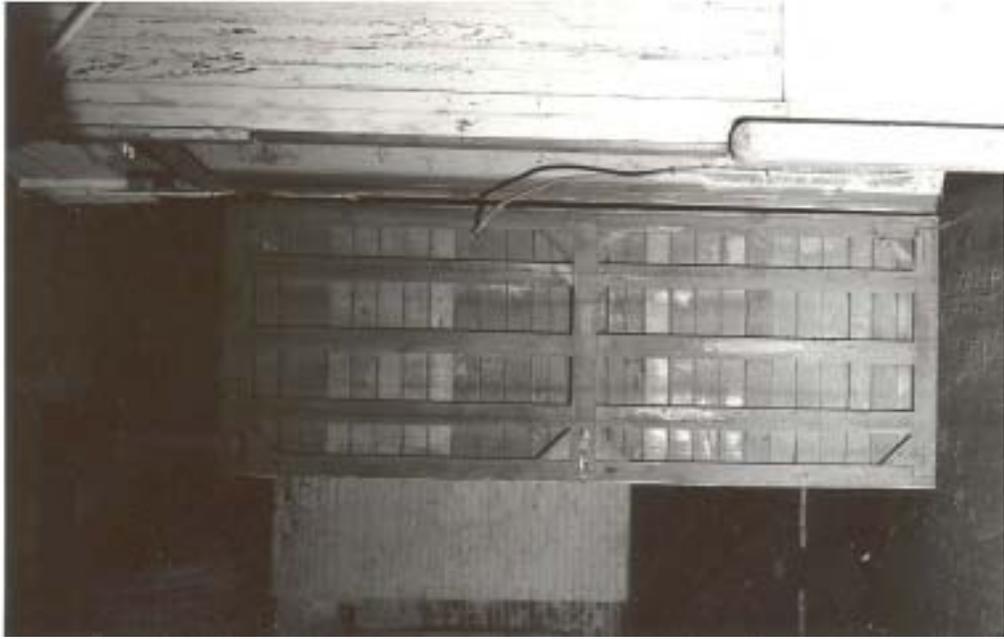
Room 201: stair side of beaded-board door in doorway D- 21, at top of stairway [1993].
